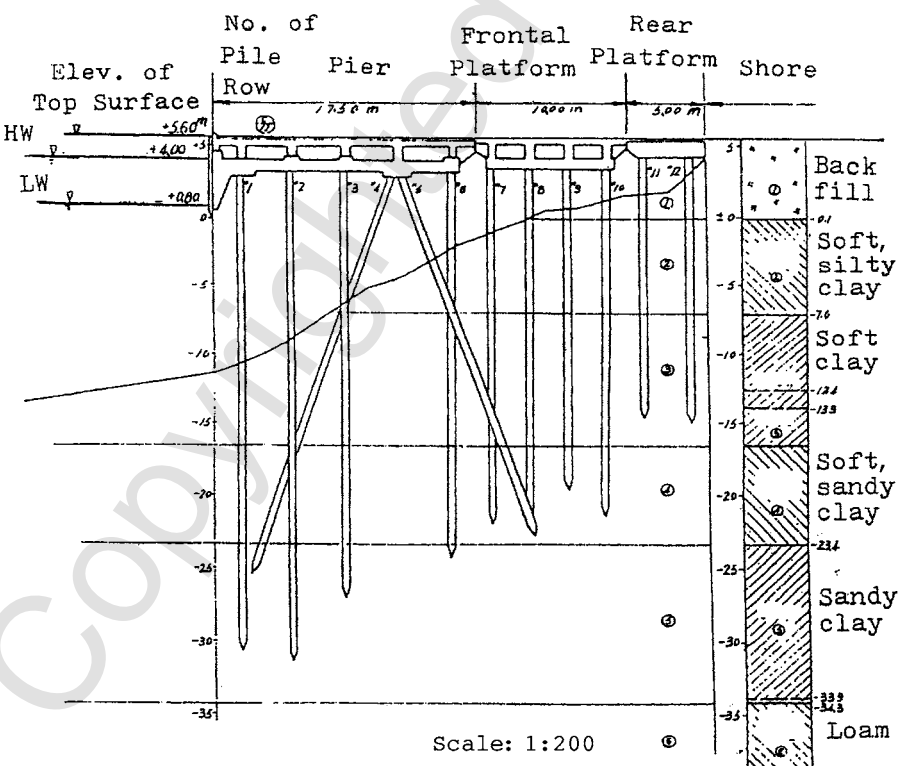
Structure of a pier and typical boring log (from Long et al., 1983).
